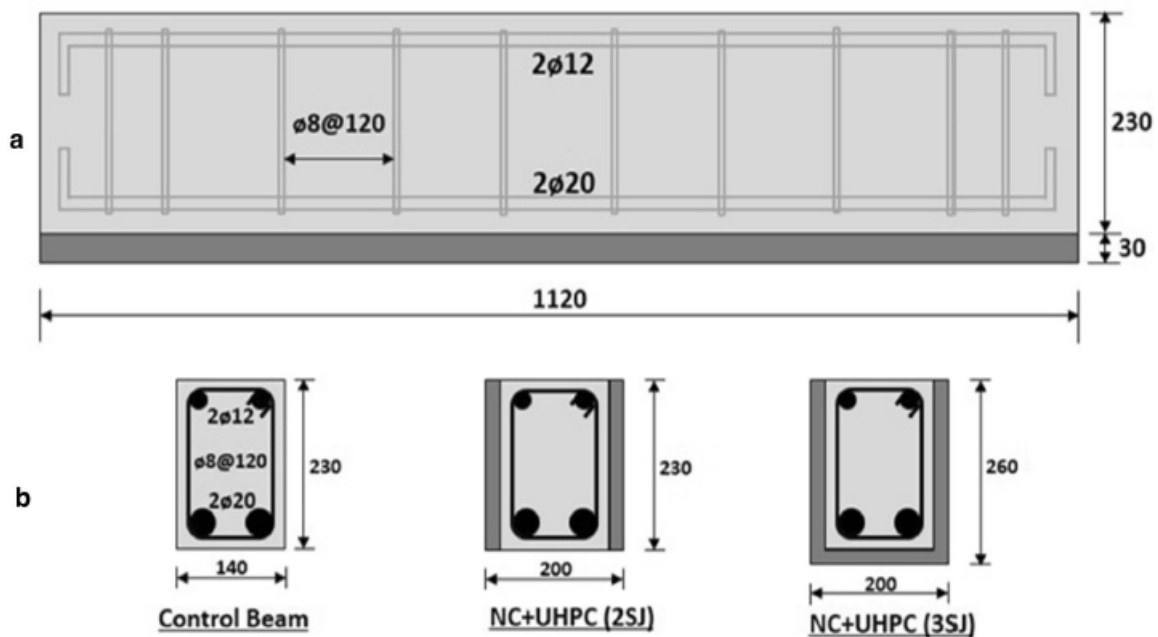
a RC beam details, b strengthening configurations (all dimensions in mm)
